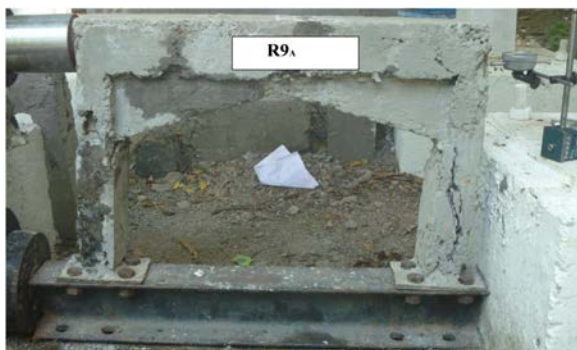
Epoxy repaired, with partial concrete infill central-braced frame.
